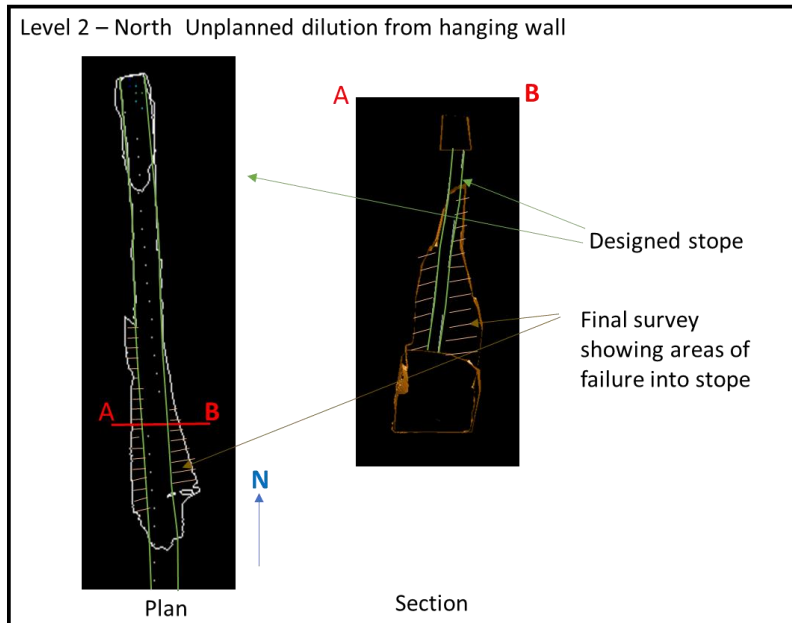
Level 2 – North. Unplanned dilution from hanging wall.
